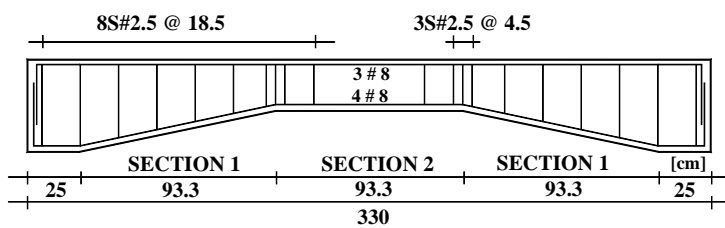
Reinforcement arrangement for beam TASCα4-R1-c
